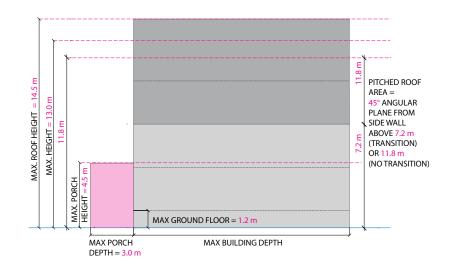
SIDE ELEVATION WITH FRONT PORCH
